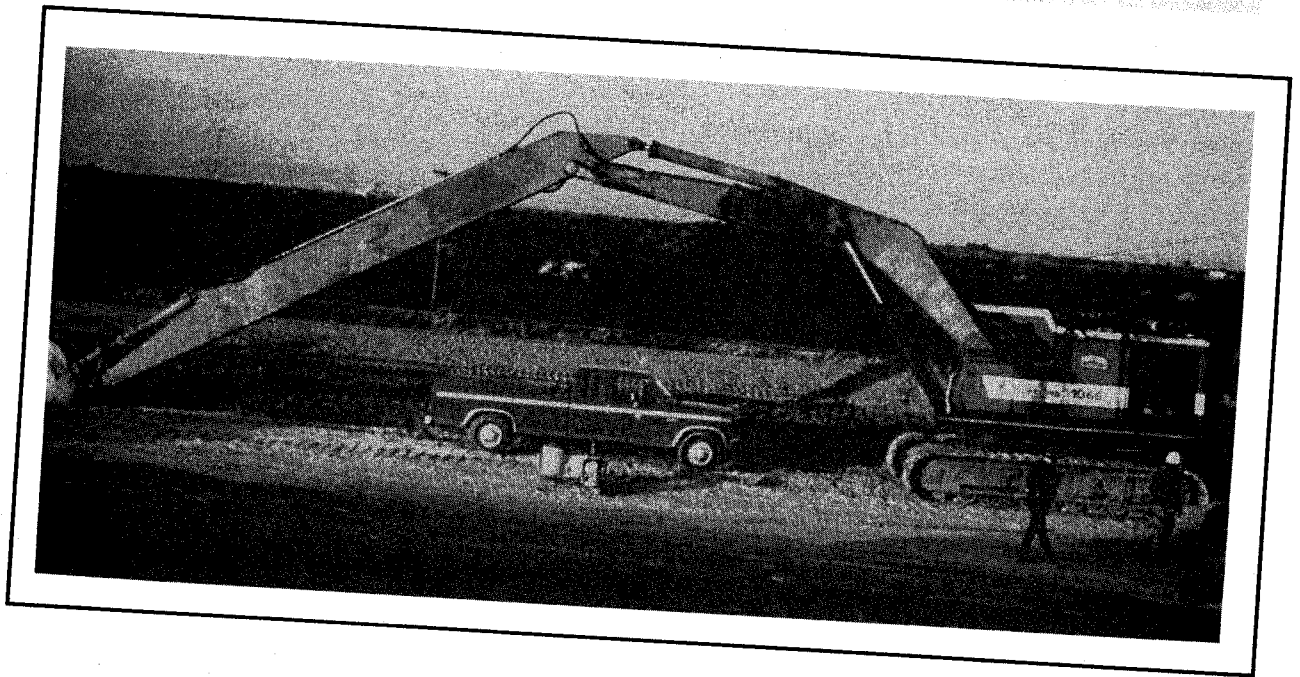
Backhoe for Excavating Slurry Trench.
